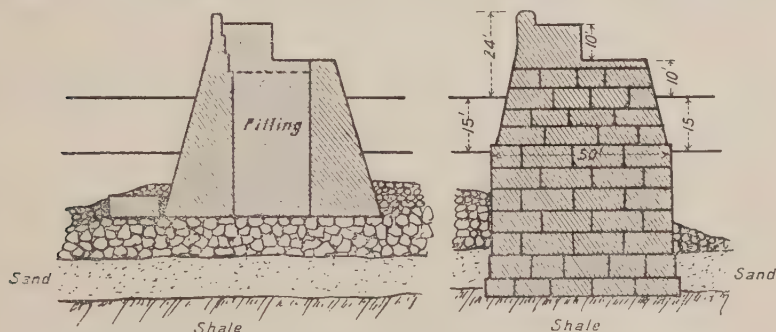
River Tyne Breakwater: Comparative Outline Sections of Old and New Work.
